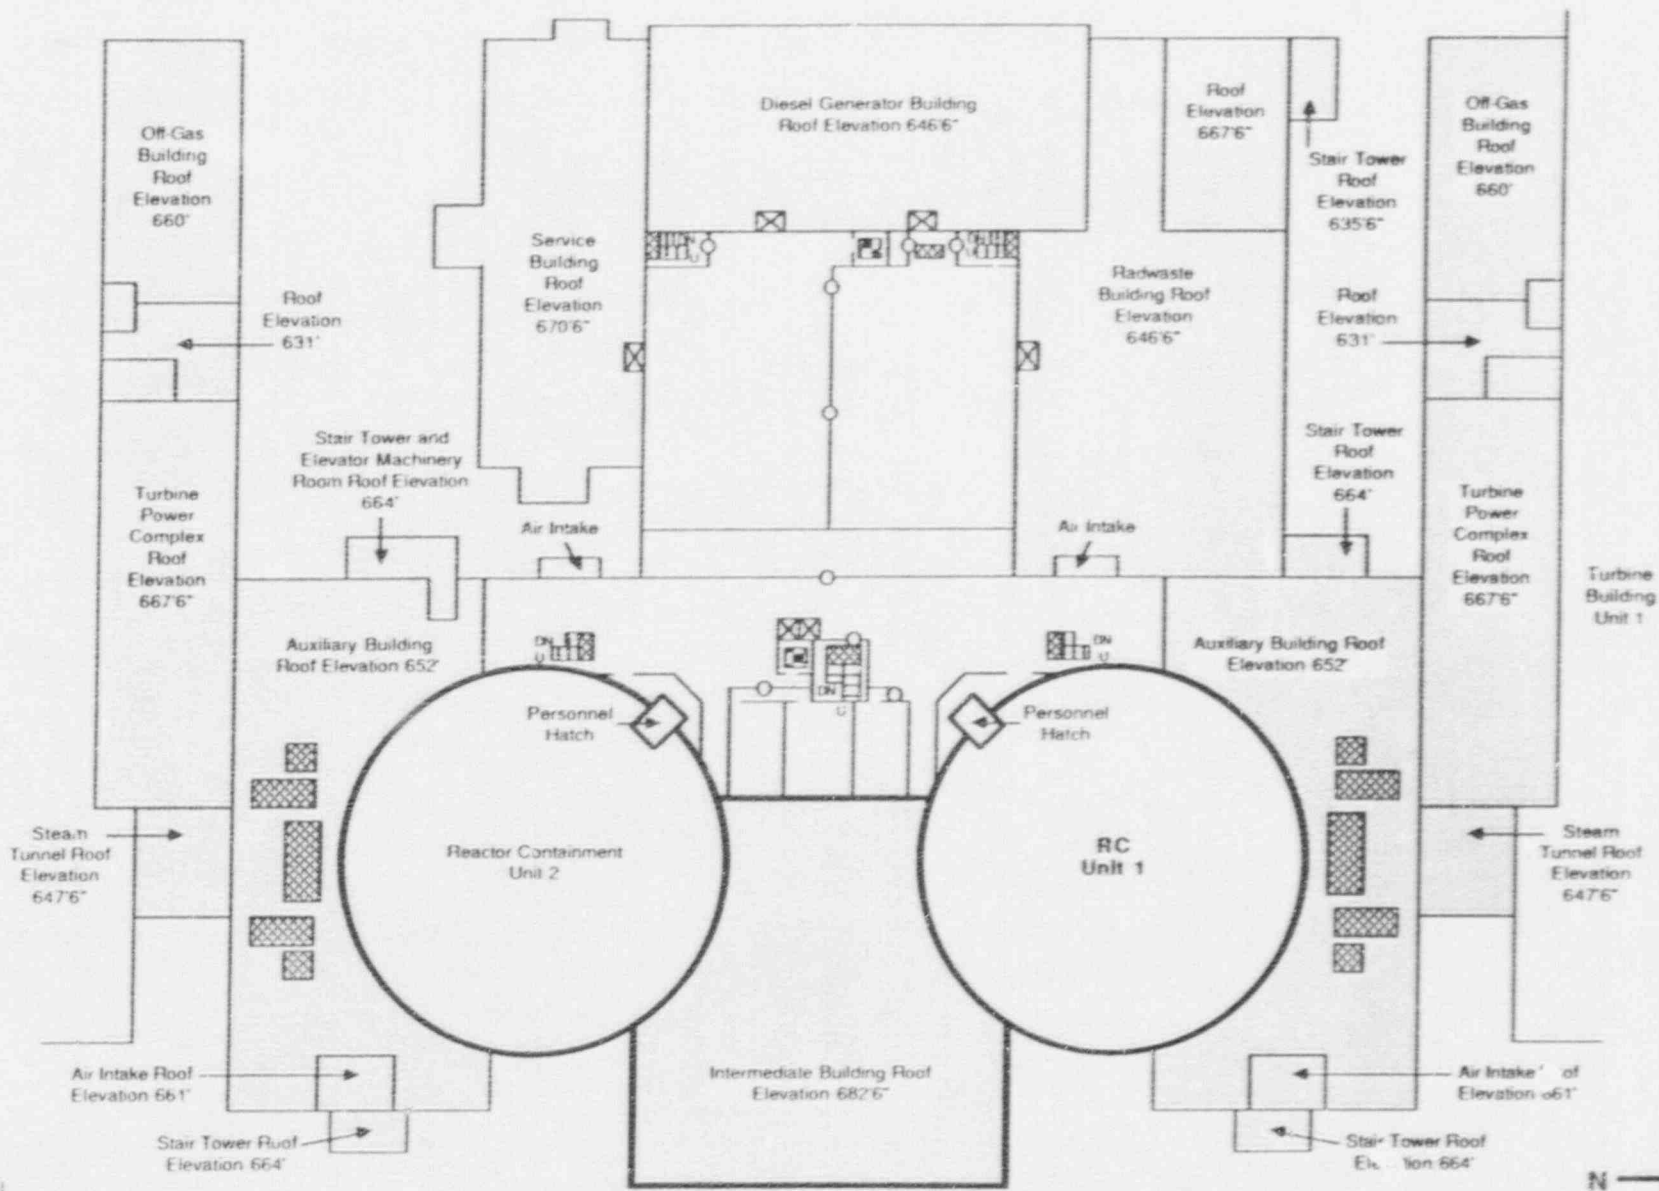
Perry 1 and 2 Reactor Building, Auxiliary Building, and Intermediate Building Elevation 682'6", and Control Complex Elevation 679'6"
